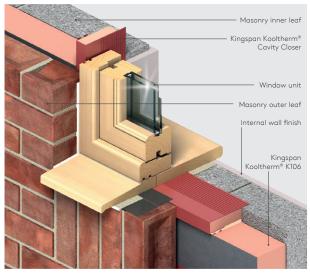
Kingspan Kooltherm® Cavity Closer in a masonry cavity wall construction with Kingspan Kooltherm® K106 Cavity Board
